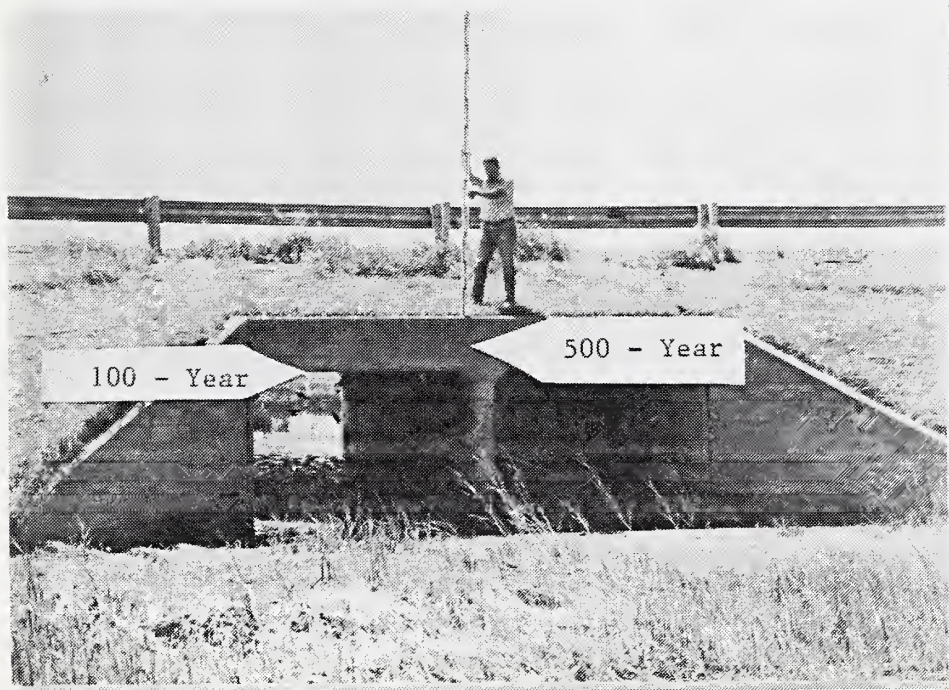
M1.32, Box Culvert (Highway 13)
